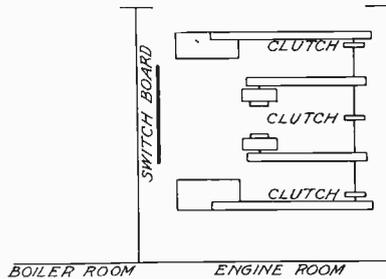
Diagram of Arrangement of Machines Using Jack Shaft
